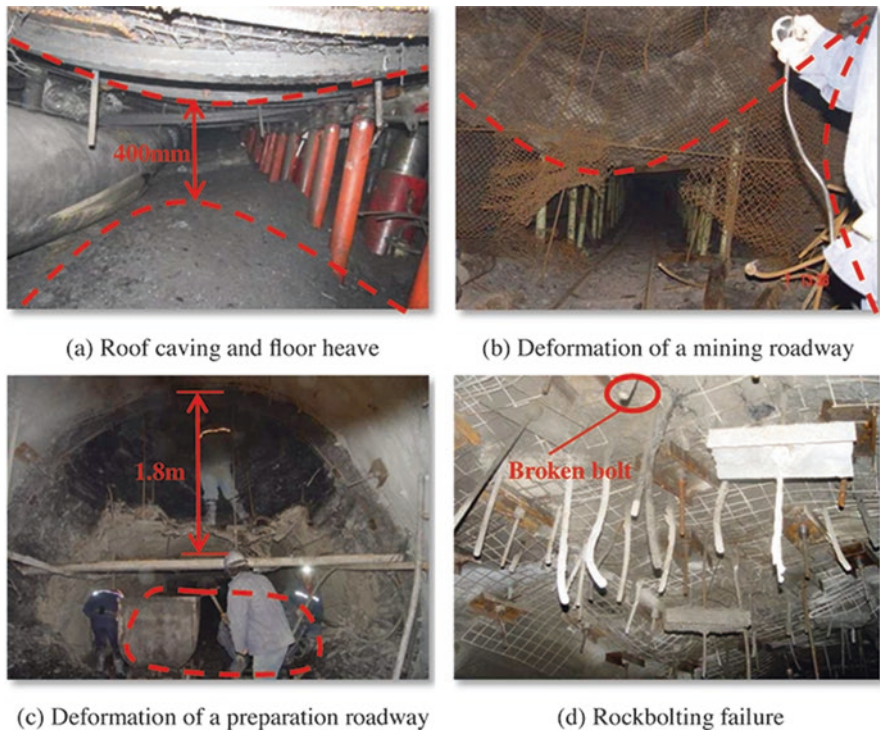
Large deformation and ground failure of soft rock excavations (He et al. 2010). (a) Roof caving and floor heave, (b) Deformation of a mining roadway, (c) Deformation of a preparation roadway, (d) Rockbolting failure
